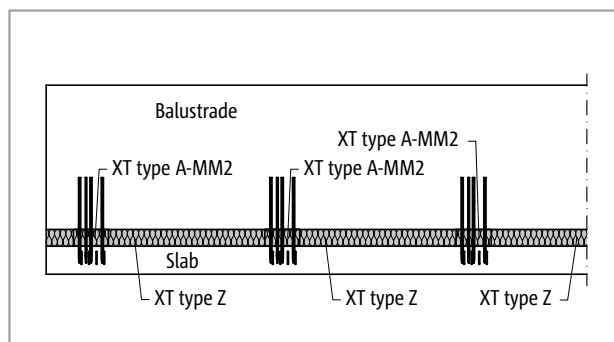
Schöck Isokorb® XT type A, Z: Parapet (XT type A-MM2)
